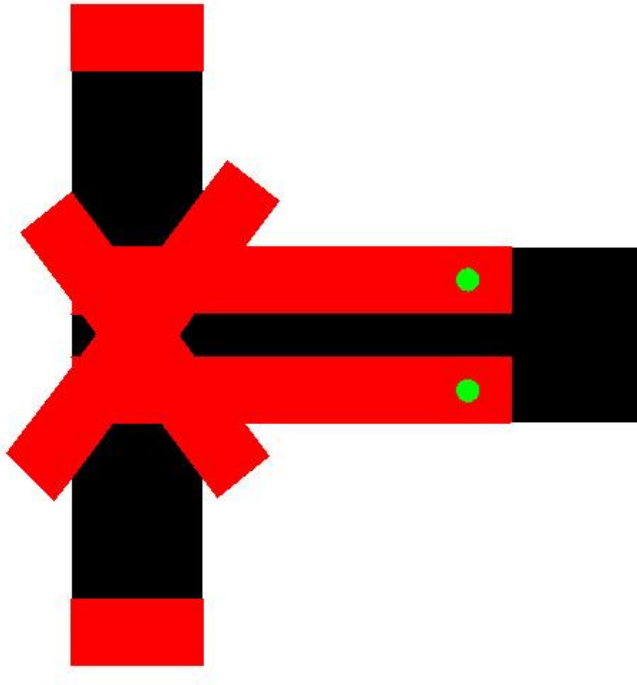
FRP layout (Note: Red denotes FRP; green denotes Tapcons® discussed later; black denotes concrete and grout.)
